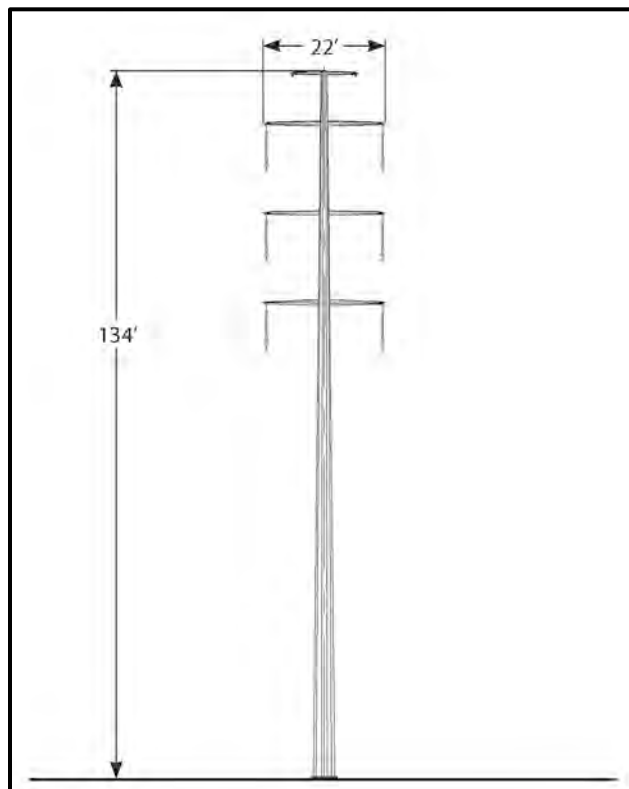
Typical 230-kV direct embedded tangent tubular steel pole diagram.
